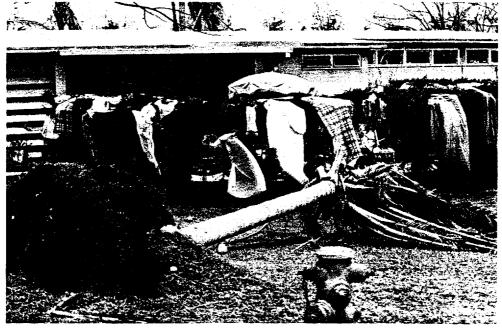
Few, if any, establishments on Guam escaped water damage from Pamela's driving rains. Massive destruction to power transmission facilities rendered drying-out a slow process. (Official U.S. Navy photograph)
